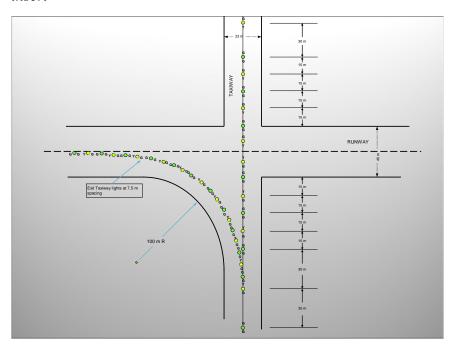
Typical Taxiway Centreline Lights Layout
